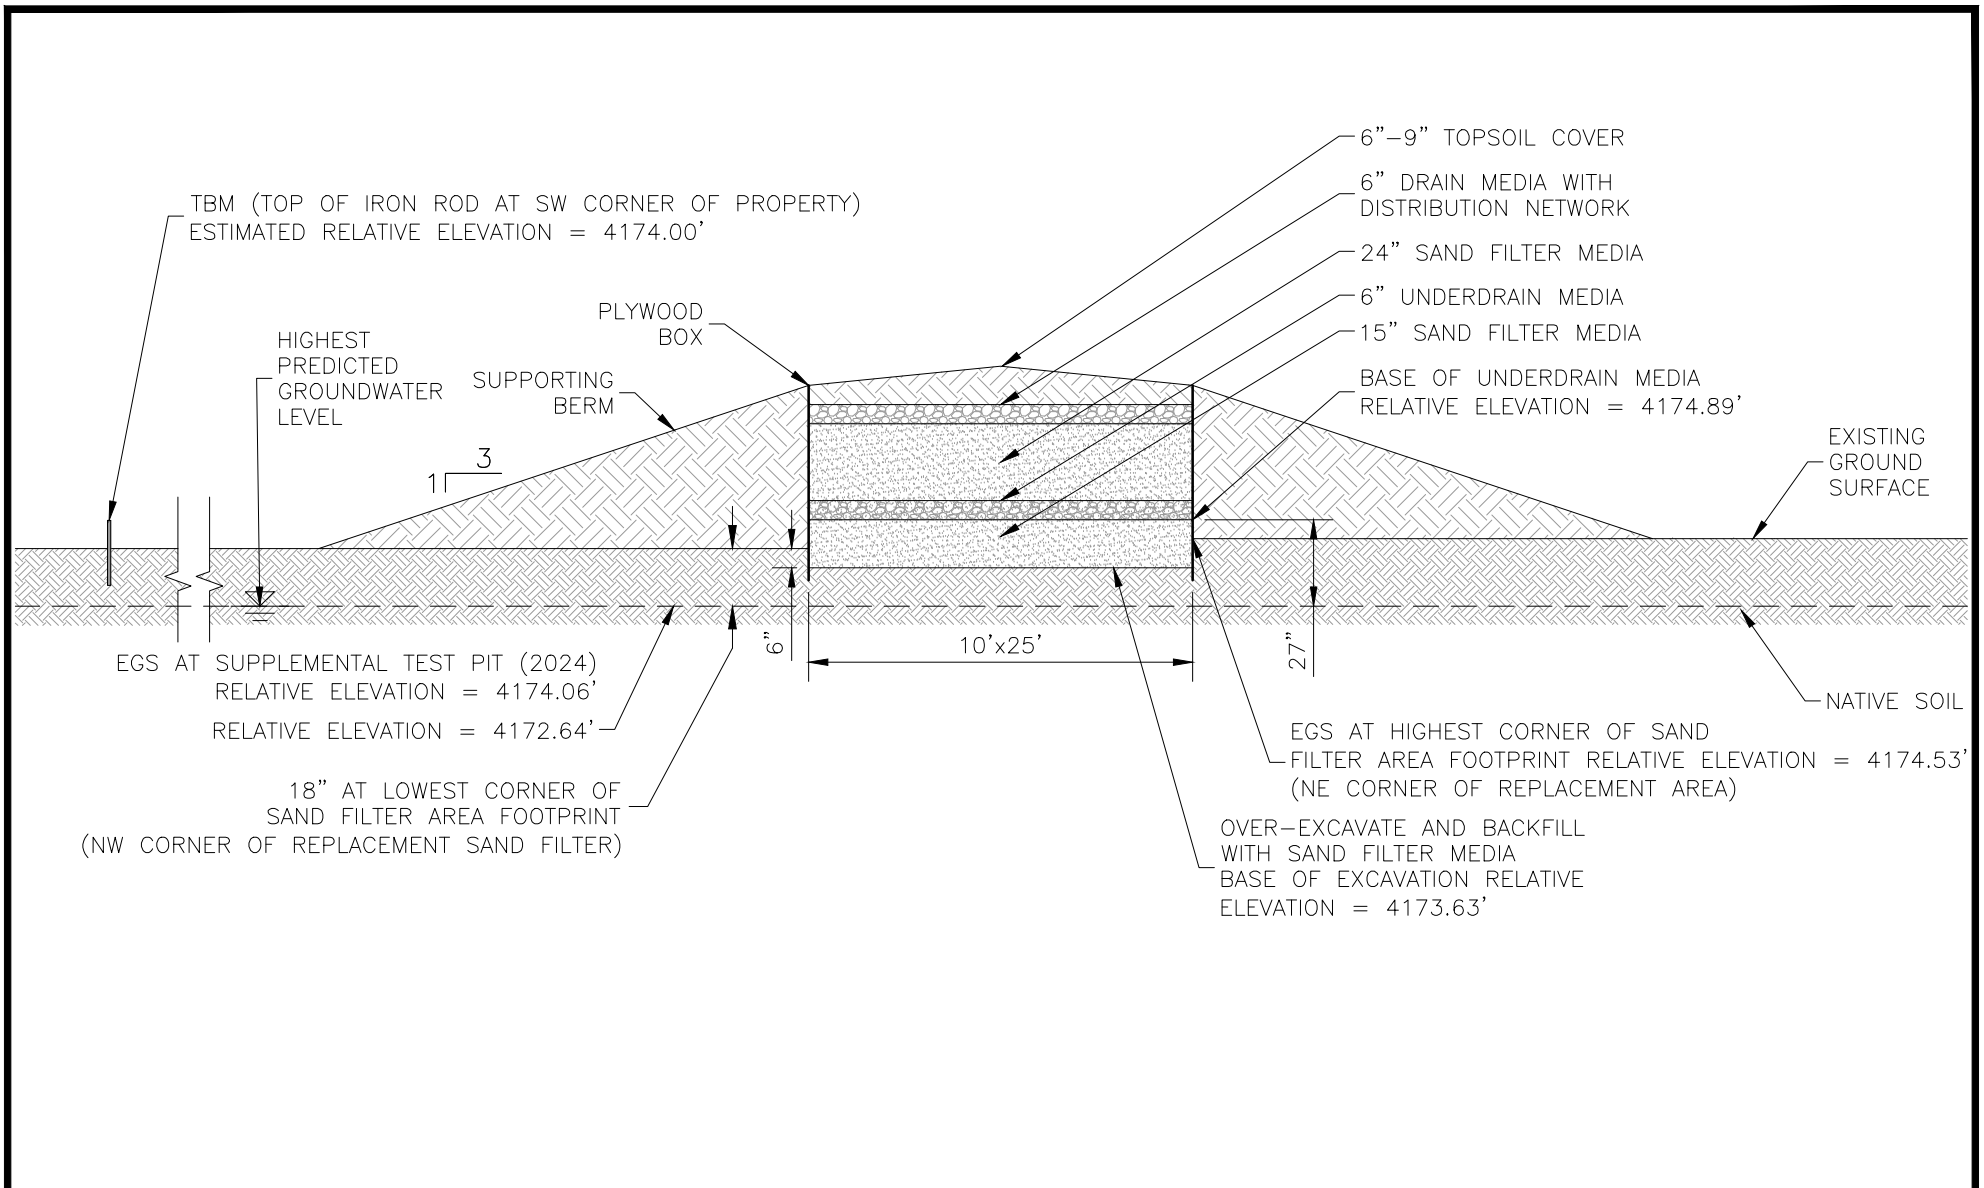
B. Modified Bottomless Sand Filter Section – Replacement
